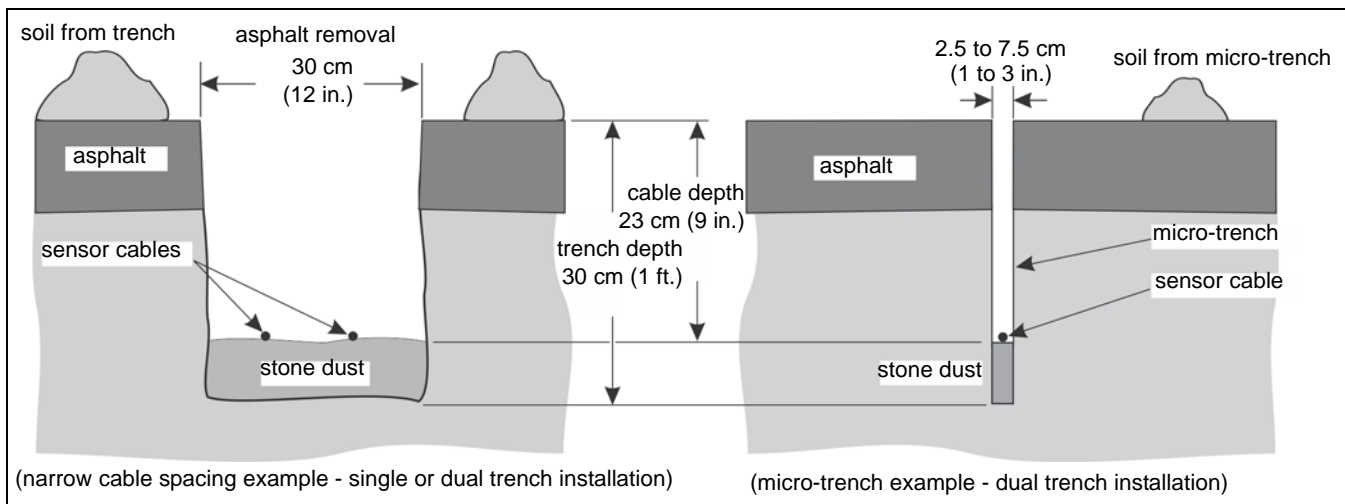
Trench dimensions under a large asphalt surface (narrow spacing/micro-trench)
